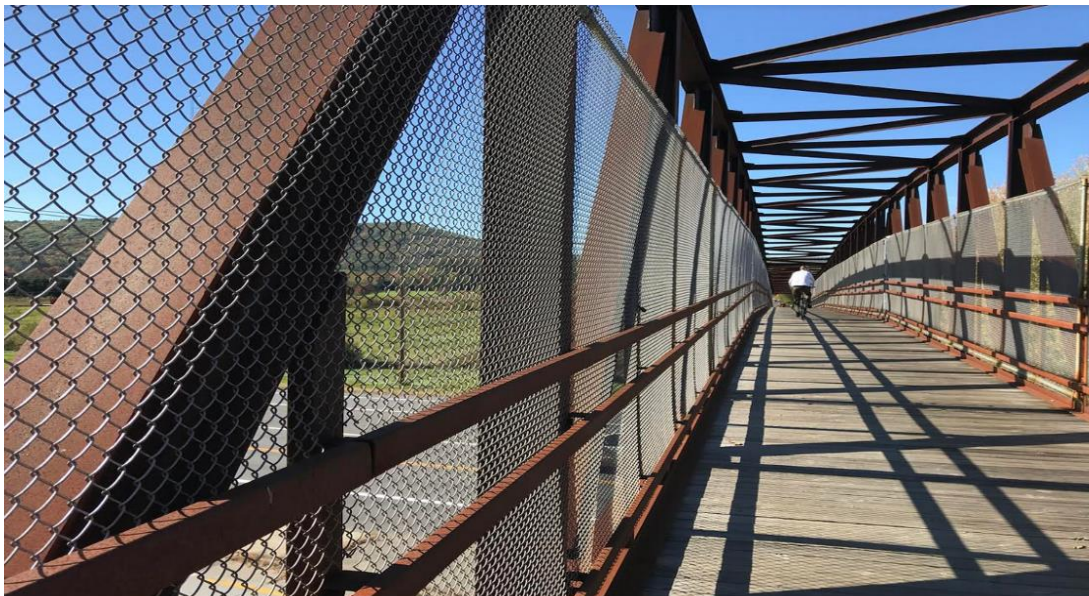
Bicycle Path Bridge over Route 12. Photo Source: Authors.
